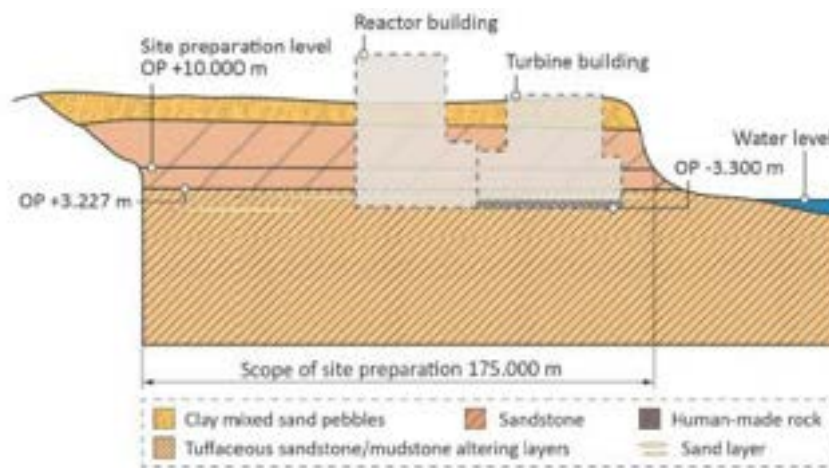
Cross section of the Fukushima Daiichi construction site [41]
